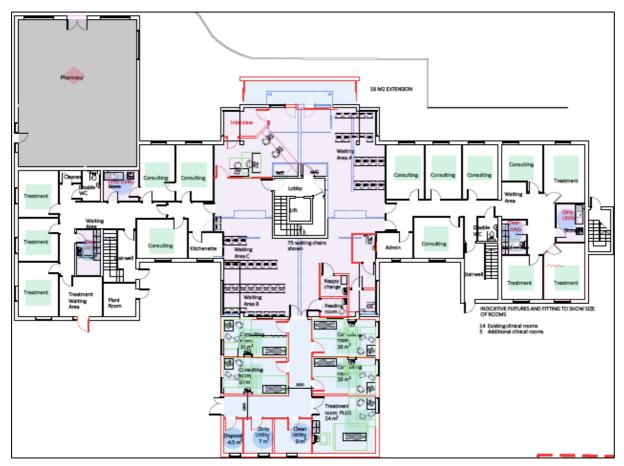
Sprowston proposed Hub - Ground Floor Plan
